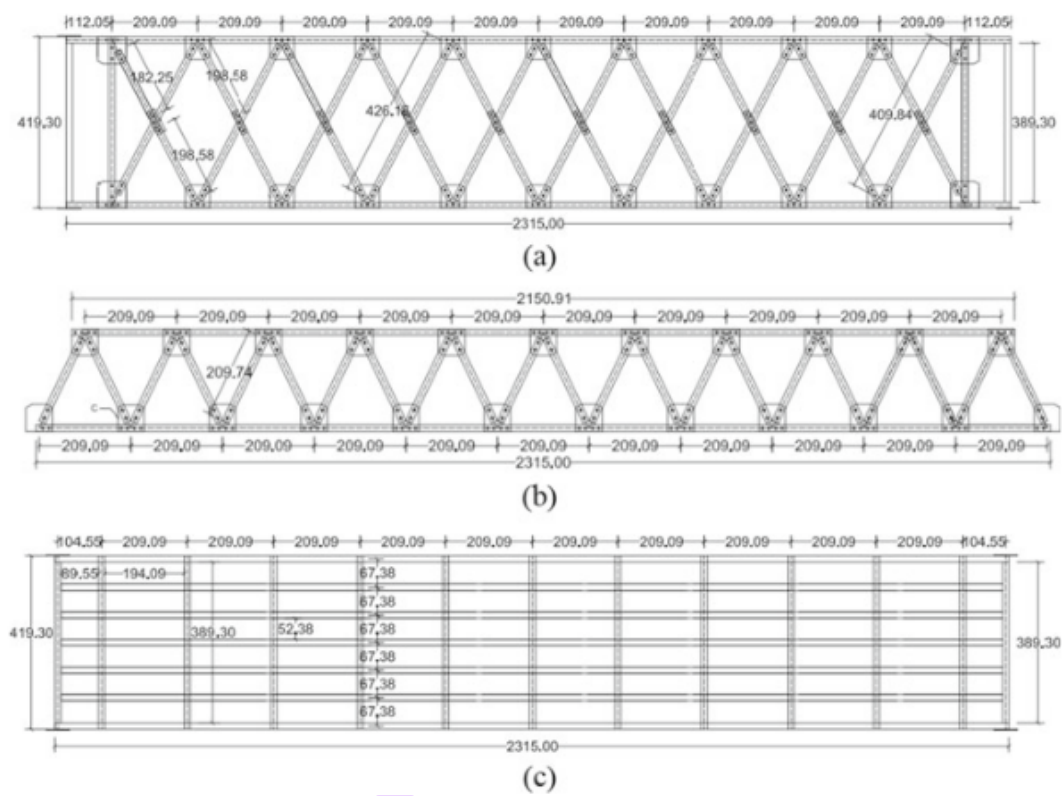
Prototype bridge: a top view, b side view, c bottom view
